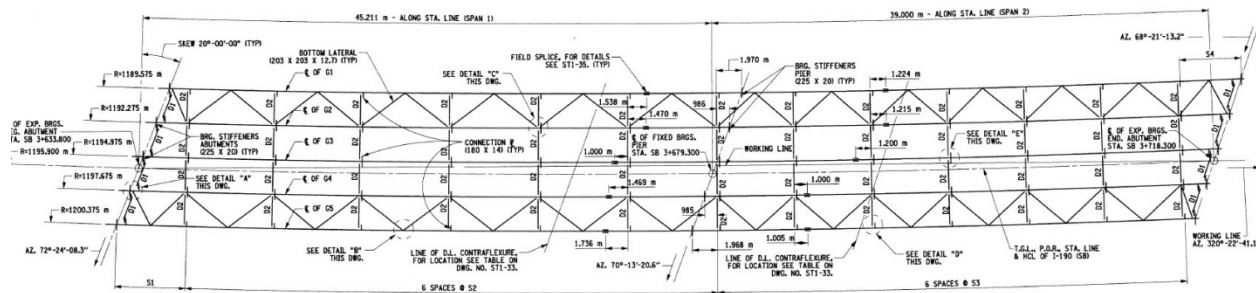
Framing Plan of I-190 over CSX Railroad (Southbound)
